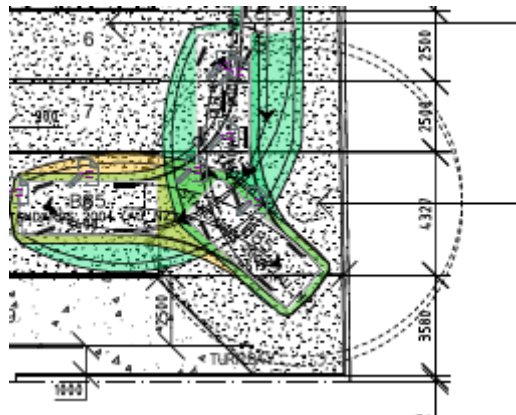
Detail of manoeuvring area required under tree canopy (tree protection zone)
